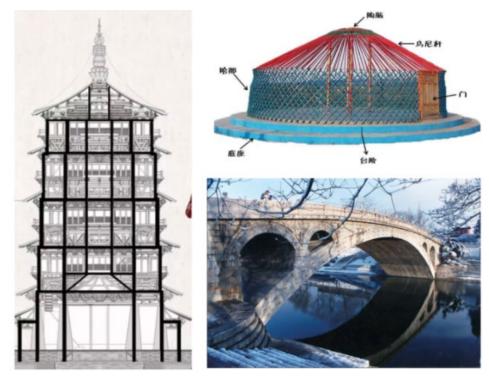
Typical early Chinese structural forms: Yingxian Wooden Pagoda - Yurt - Zhaozhou Bridge (http://www.360doc.com/content/20/0428/07/37299807_908837865.shtml)
